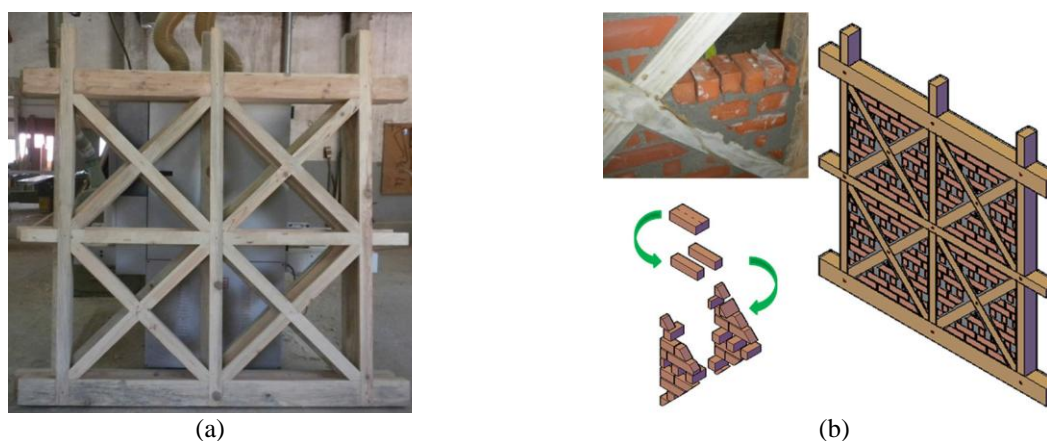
Wall construction: (a) general view; (b) detail of the masonry infill.
